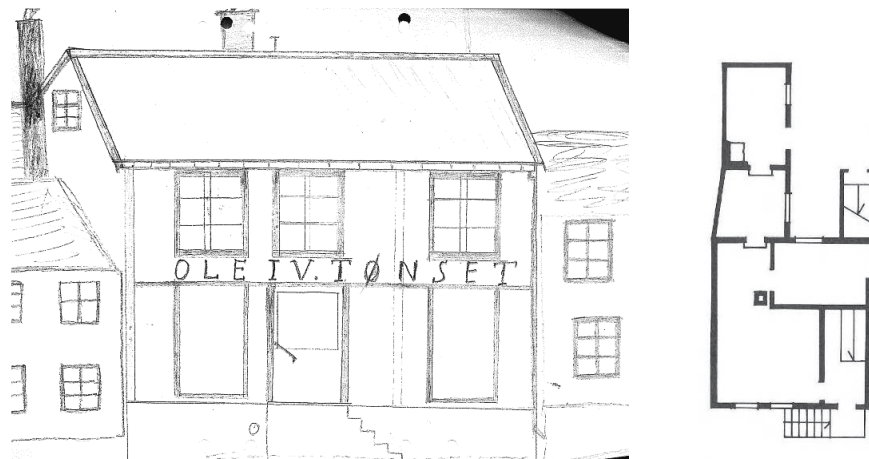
Kjerkgata 58 façade sketch (left) and floor plan (right), floor plan by P. Tandstad 1982. The sketch was submitted to the local building authorities in 1946 to illustrate plans to extend the shop premises on the ground floor by closing the old gateway. In 1948 a permit for the conversion was given by the local authorities, based on new drawings by E. Solberg where the shop entrance and steps were moved from the centre of the façade to the gateway entrance (this second set of drawings was not included in the case file). (Røros municipal building archive; P. Tandstad, Riksantikvaren archive)
